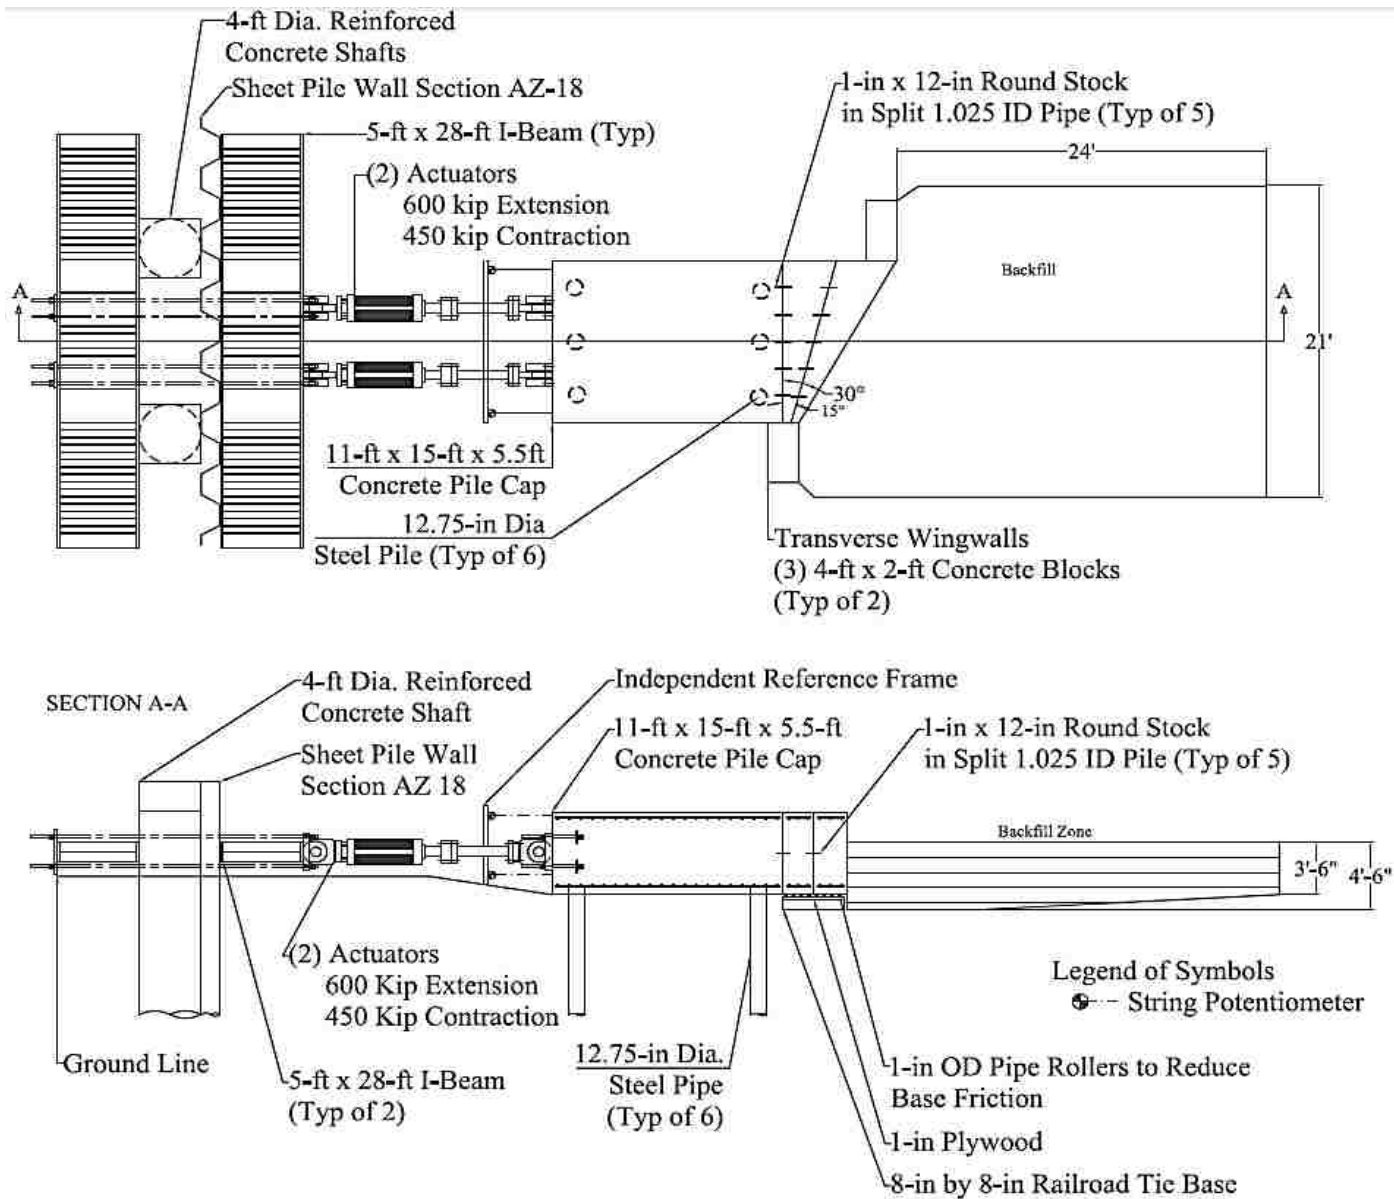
Schematic plan and profile drawings of field test layout (NOTE 1 ft = 0.305 m).
